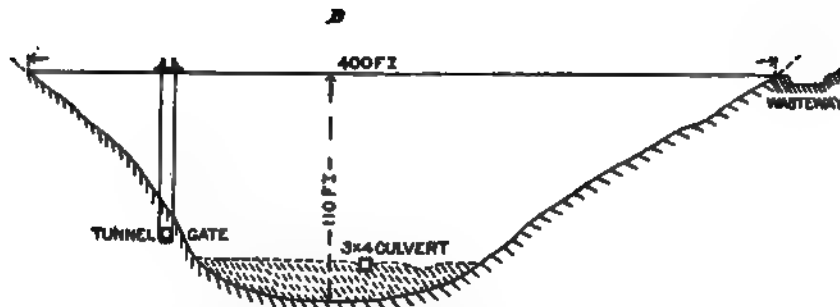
Walnut Grove dam. Cross section and elevation.
